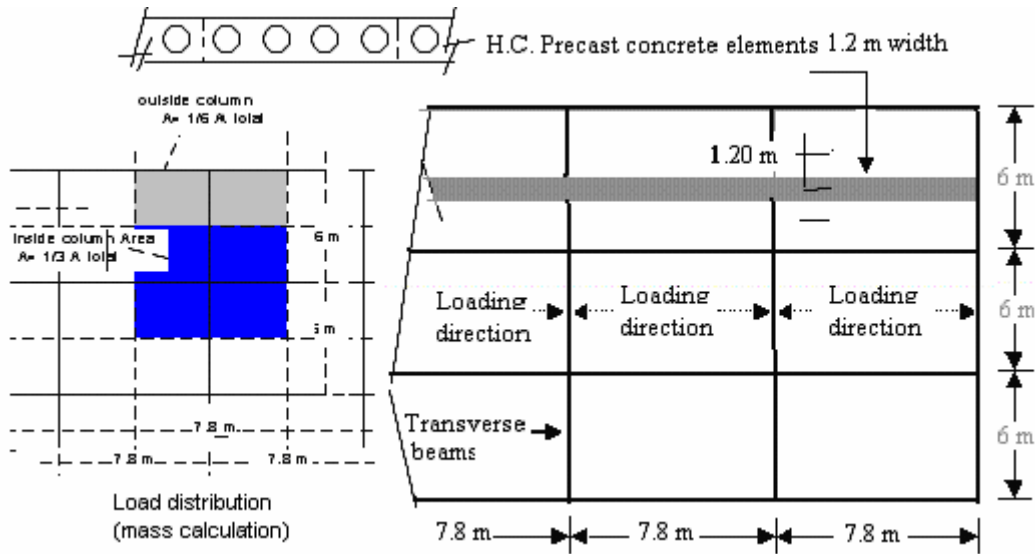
Floor of longitudinal, transverse beams and precast units floor
